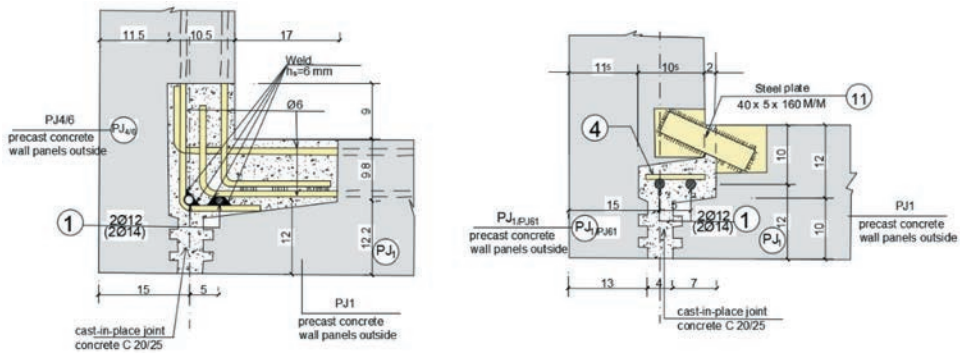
Wall panel L-connection (joint VJ1): a) joint at the bottom of the panel, and b) joint at the top of the panel.
